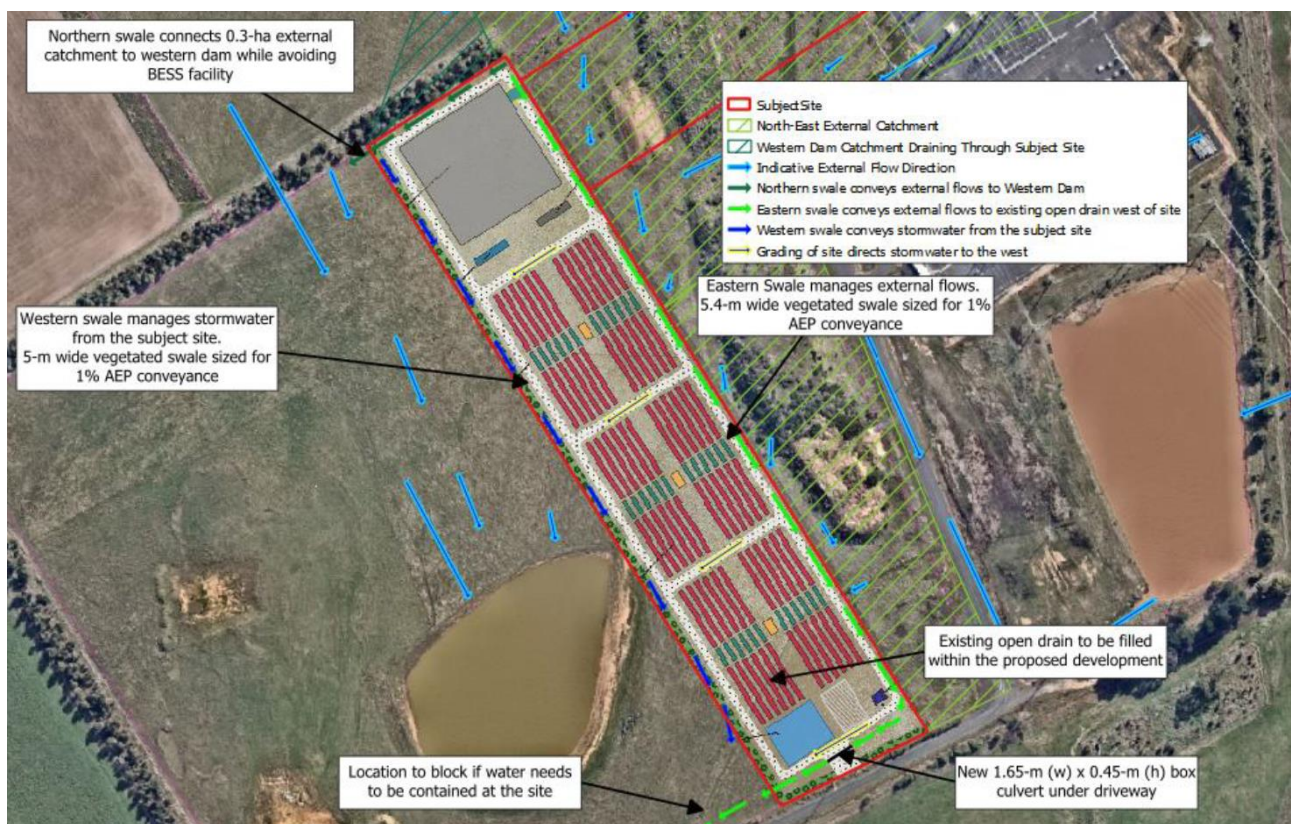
Proposed Stormwater Management Strategy Layout Plan (Source: Application)
